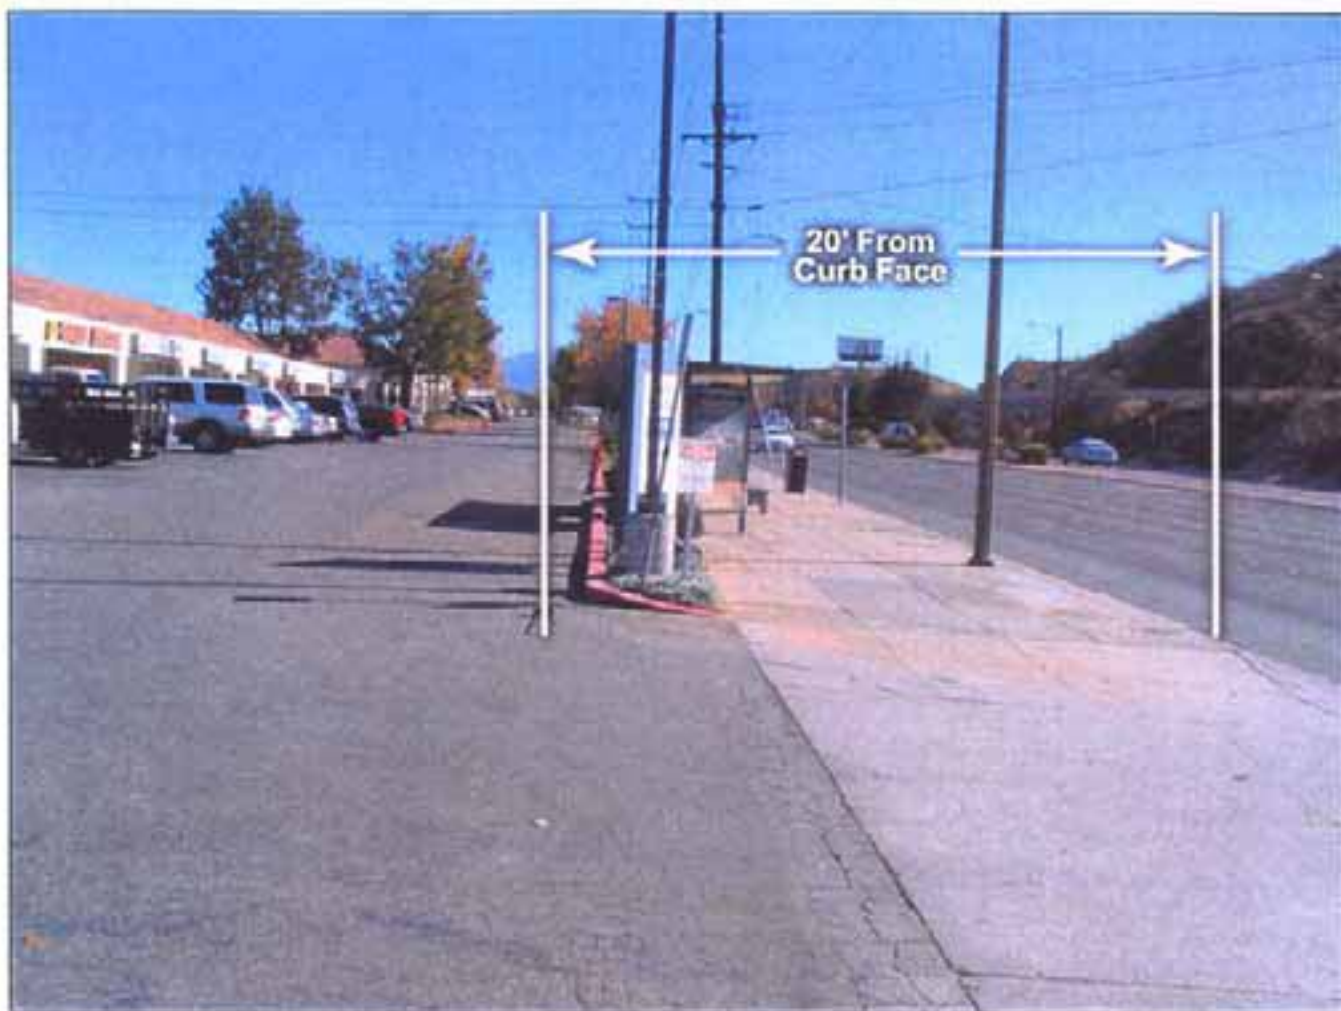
Facing South Bouquet Canyon Road, South of Soledad Canyon Road/Valencia Boulevard, Along East Side of Bouquet Canyon Road
